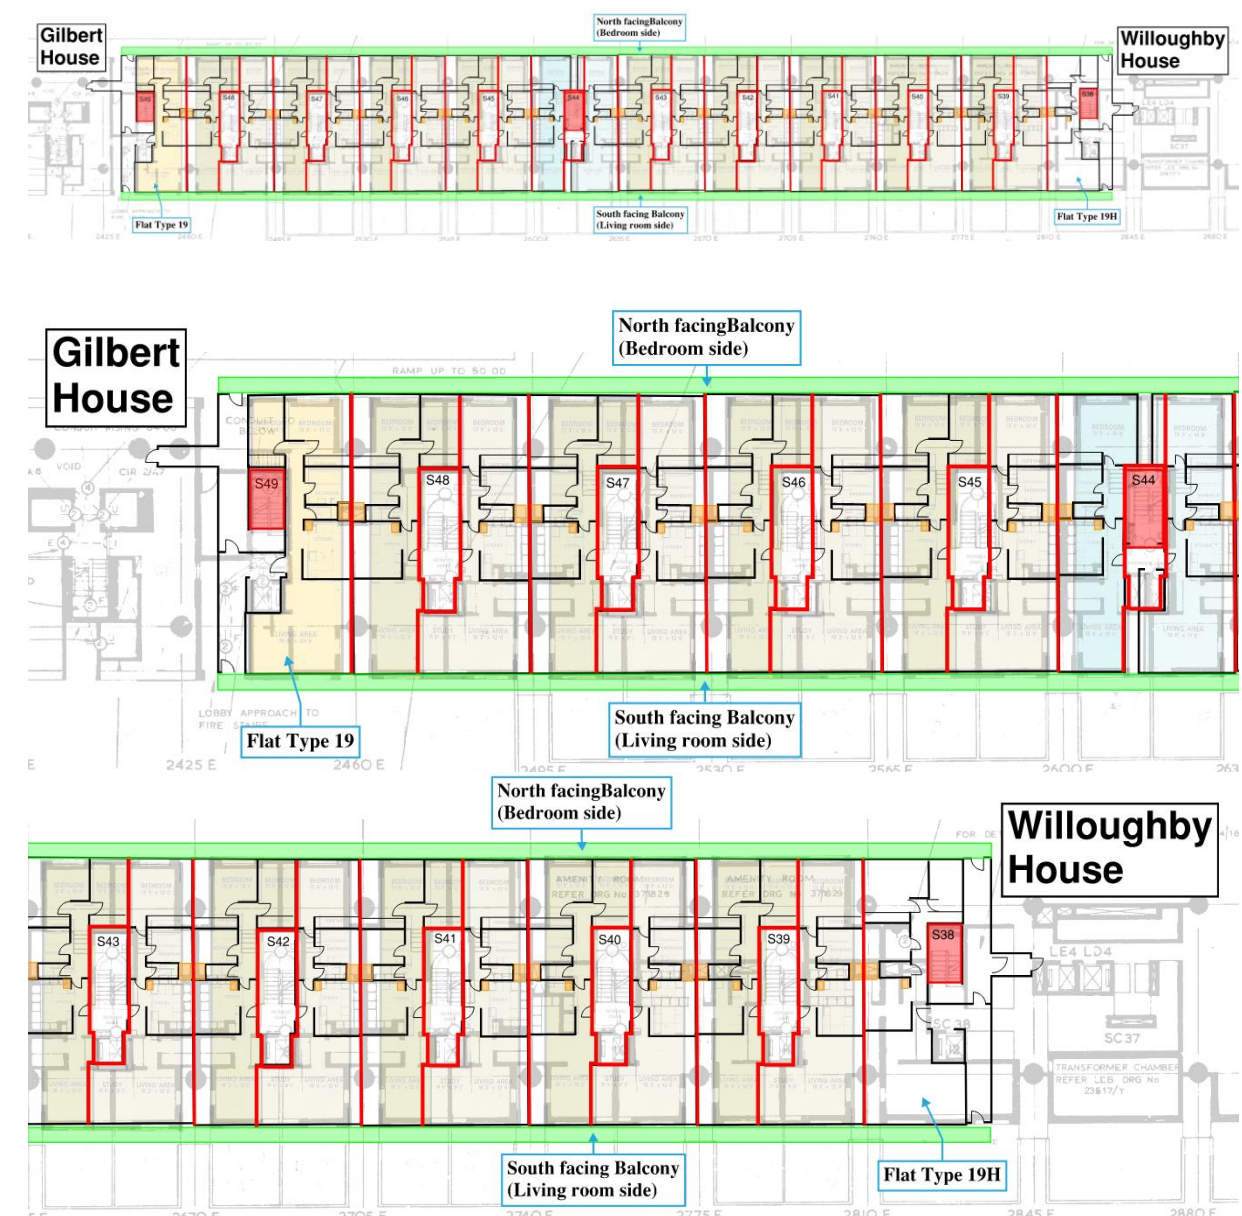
Layout of Andrewes House (Above Podium level: 1-6)
